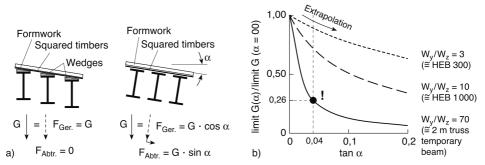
Collapse of scaffolding for a road bridge over the River Leubas near Kempten. 1974, Case 11.24 a) 2 possible scaffolding details for bridges with a crossfall
